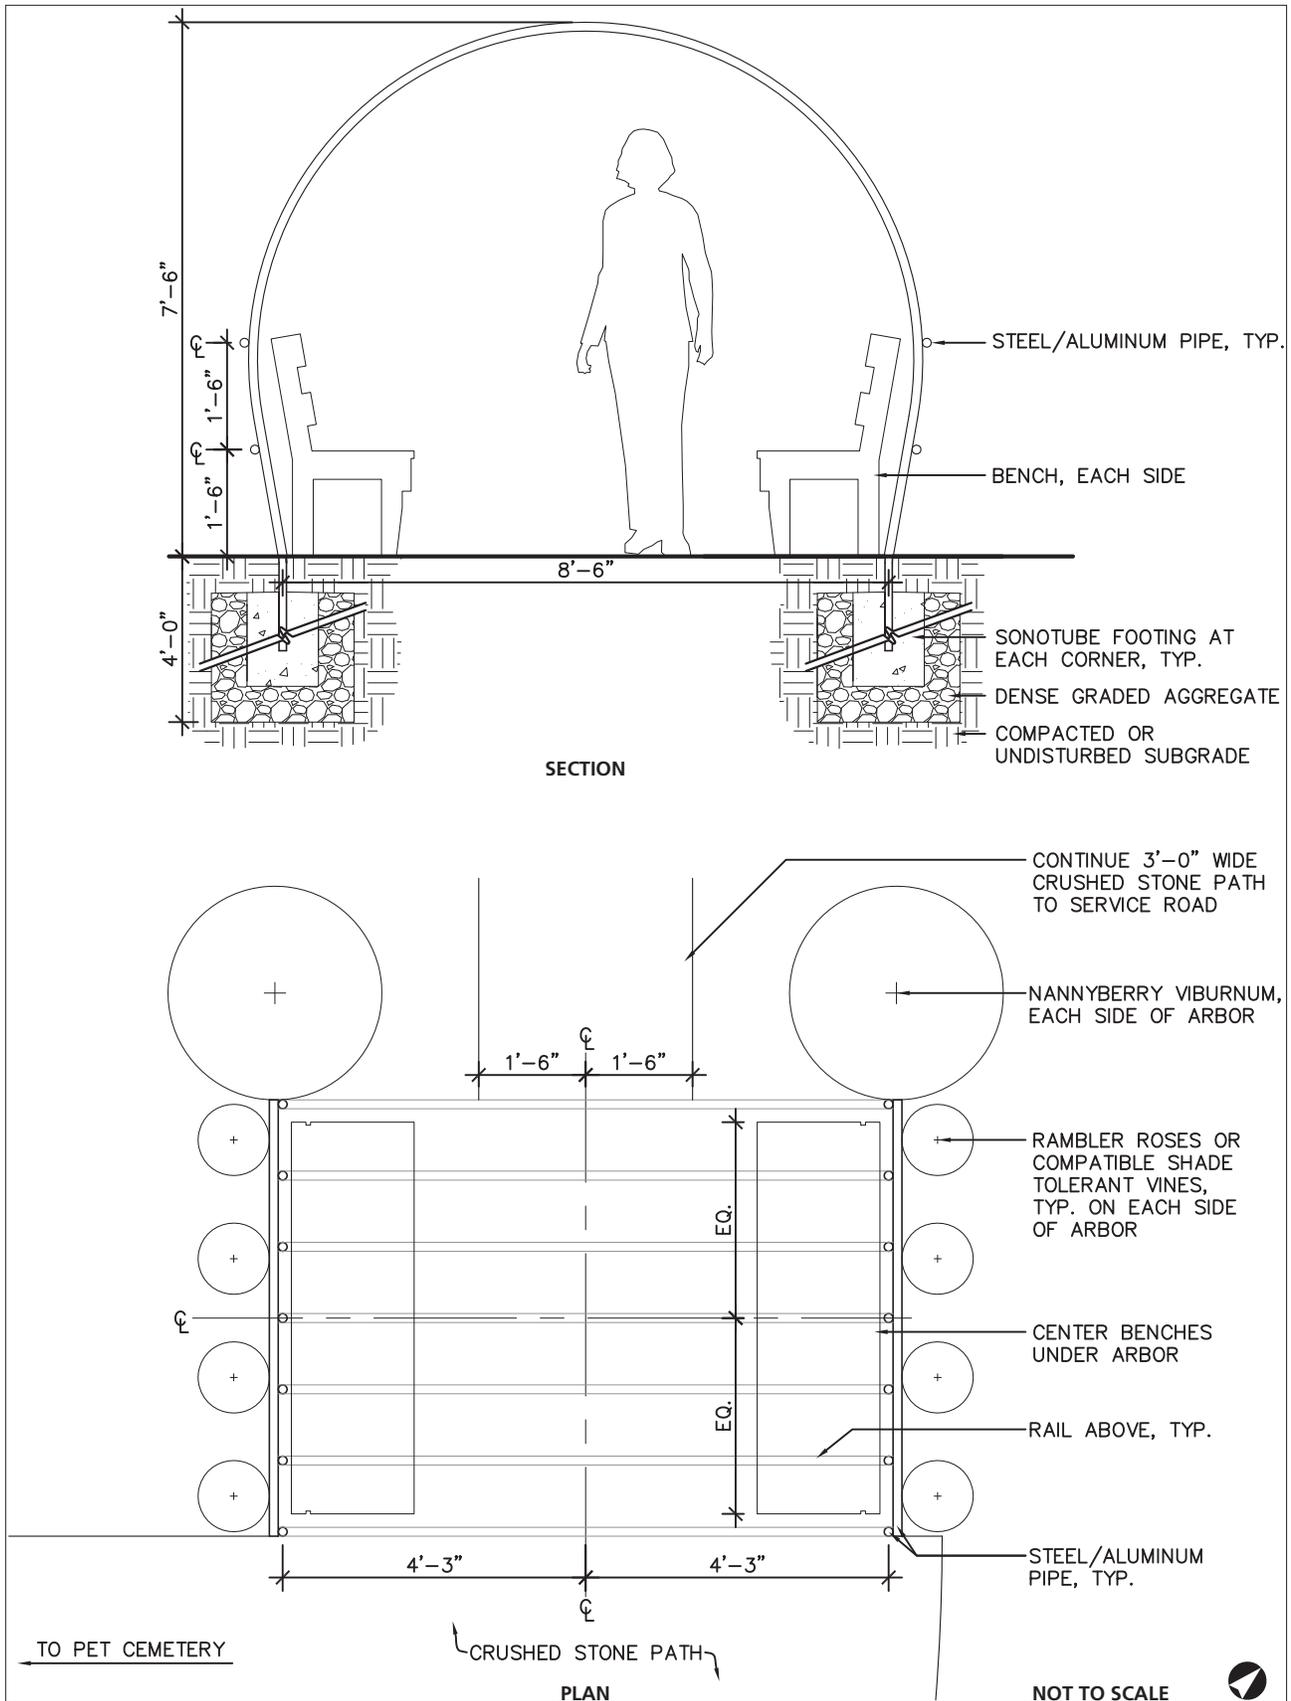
Plan and elevation for the proposed arbor, benches, and planting. Before installation of the arbor and benches, the crushed stone path should be graded to balance existing elevation differences on either side. The arbor should be aligned on center with the current path and symmetrical plantings added (Olmsted Center, 2009).
